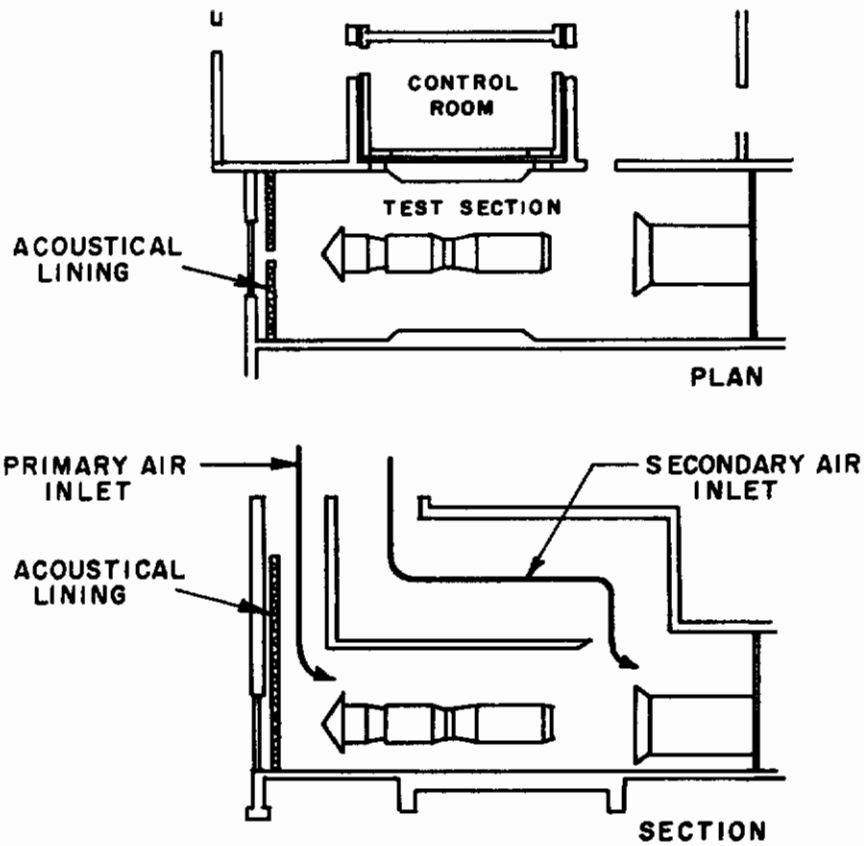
PLAN AND SECTION AT THE TEST SECTION OF A TYPICAL TEST CELL.
